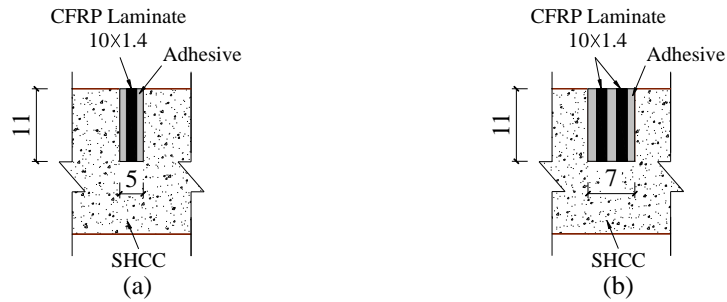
Details of configuration of CFRP laminates bonded into the grooves of HCP^(L): (a) single-CFRP laminate, and (b) double-CFRP laminates (dimensions in mm)
